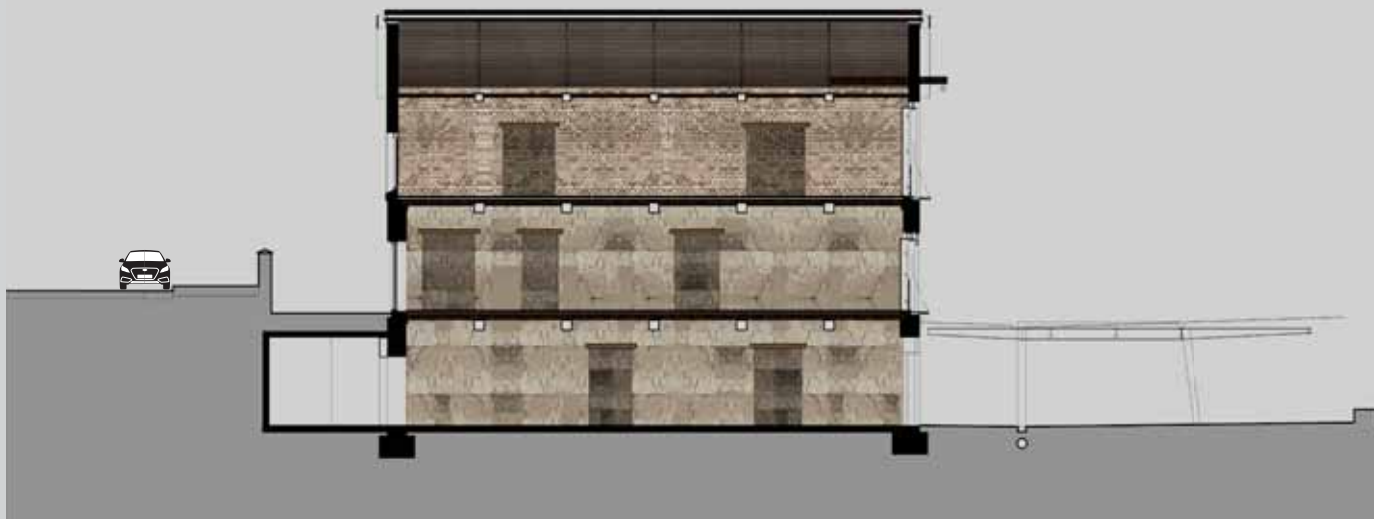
Proposed cross Section of Typical bay, stripped of existing services and finishes to reveal the original heritage fabric
